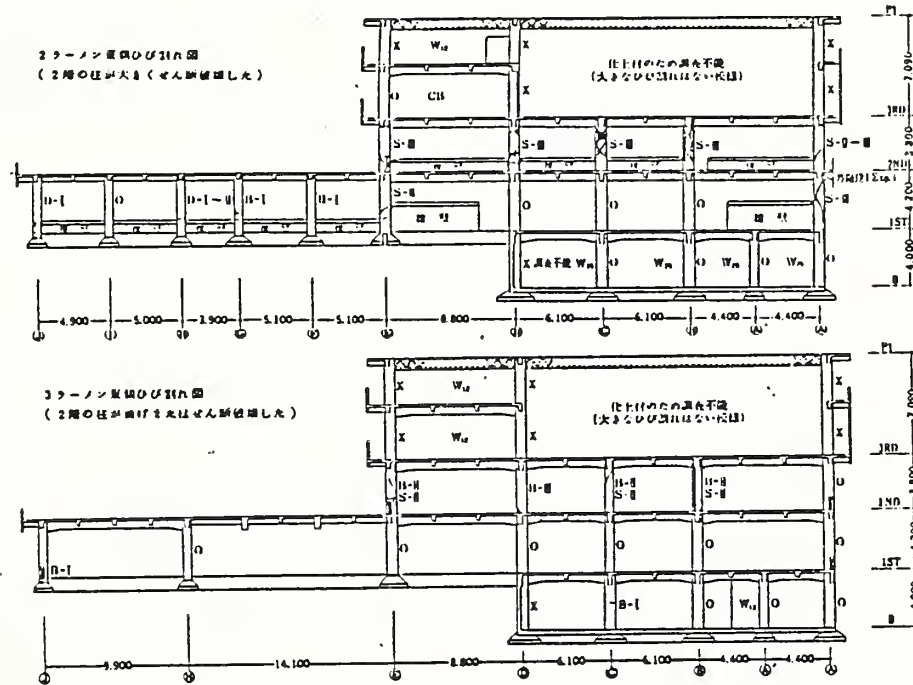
Section of 2nd & 3rd - Frames of Old City Office and the Damage of Columns in 1968 (Ref.4)
